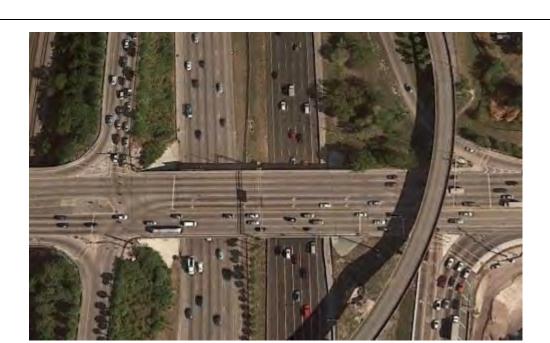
Site No. 47 – CSX Rail Corridor at Broward Boulevard – Aerial March 2017
